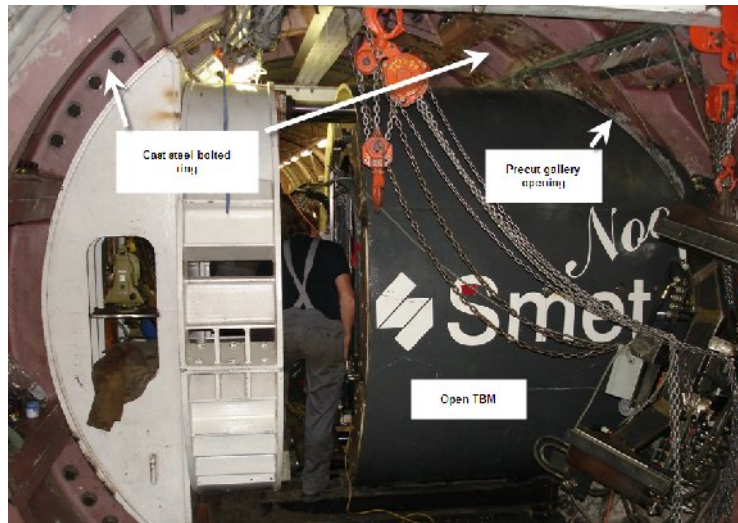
View of a TBM start in a precast reinforcement steel ring.
